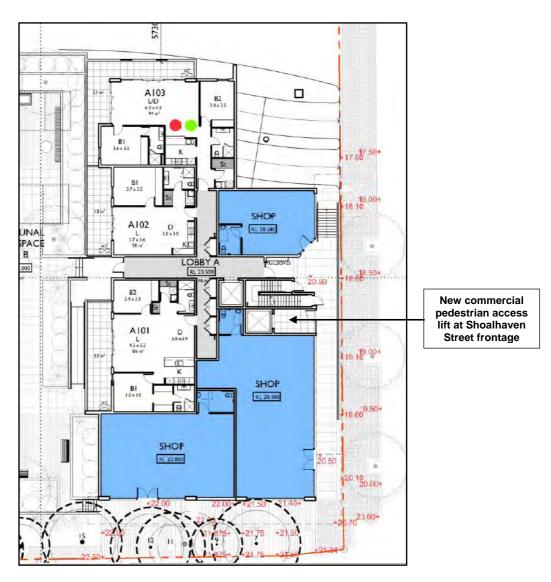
Extract from Drawing A-106 showing location of pedestrian access lift at Shoalhaven Street frontage (courtesy ADM Architects).
